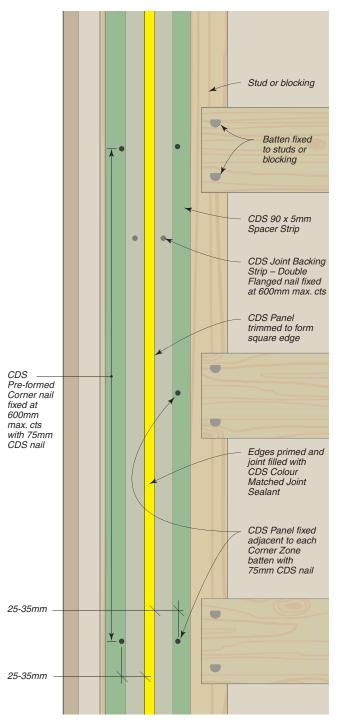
Typical Face Nailing at Square Edge Joint – Elevation
